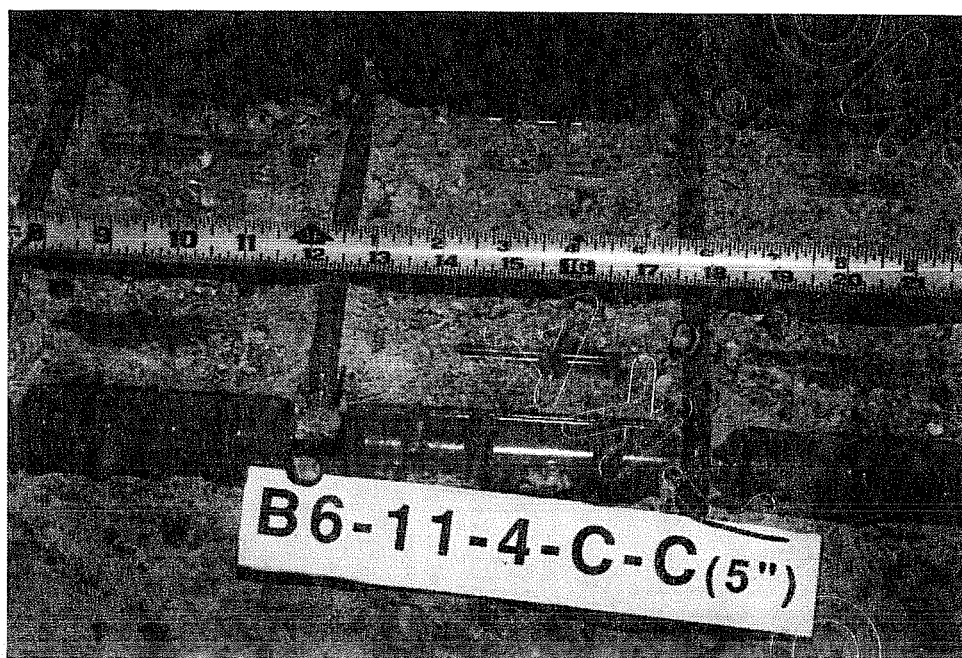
Epoxy-coated reinforcing bars after splice failure.
